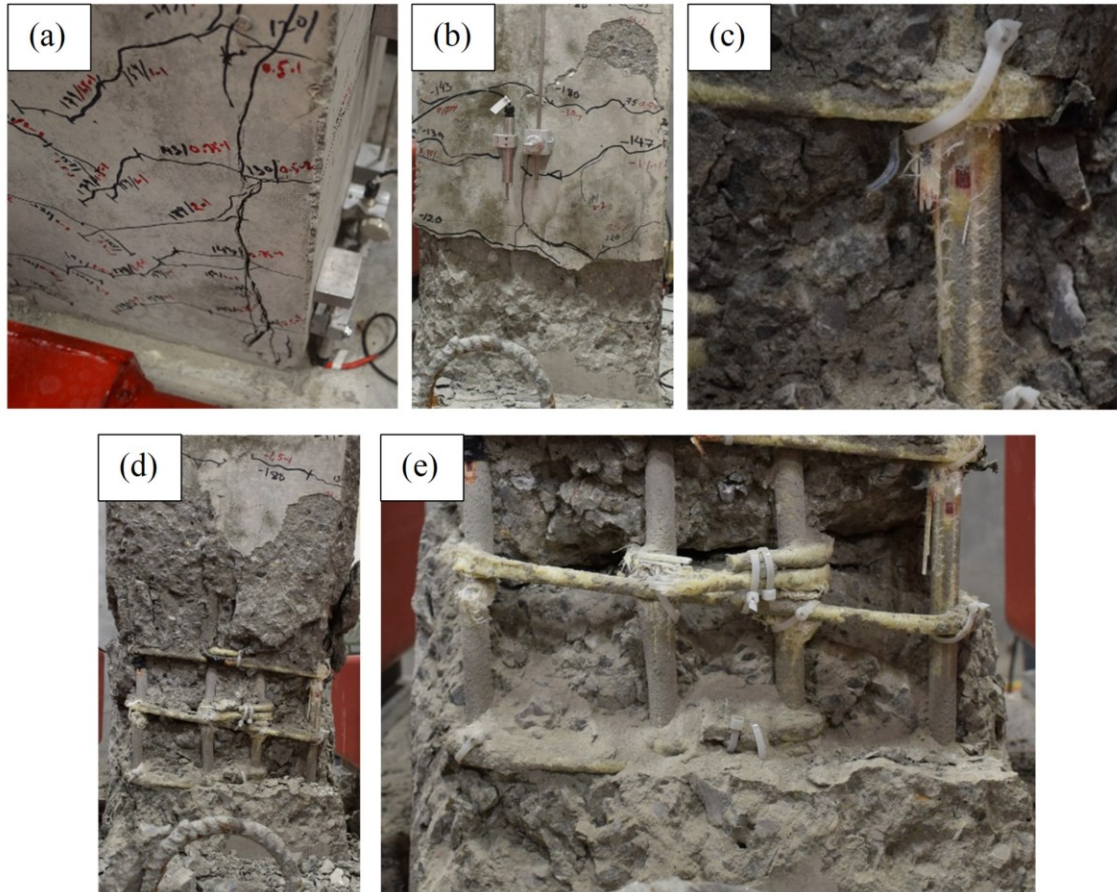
Failure progression of GFRP-reinforced columns: (a) vertical splitting; (b) concrete cover spalling; (c) fracture of longitudinal bars; (d) core concrete crushing; and (e) rupture of cross ties.
